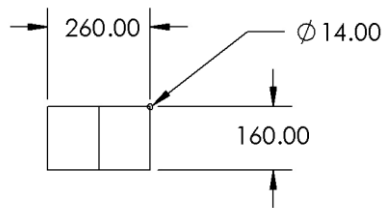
2D Drawing of Reinforced Concrete Wall of Steel Bars (Dimensions are in mm).
